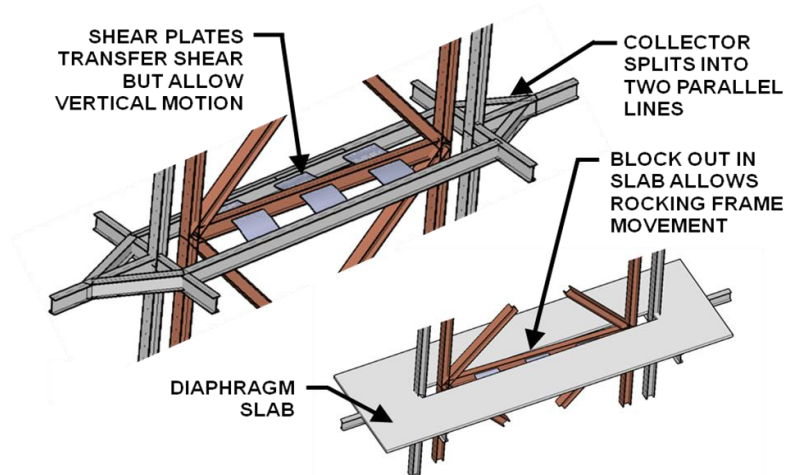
Isometric View of a Possible Diaphragm to Rocking Frame Connection that Allows Uplift Without Damage
